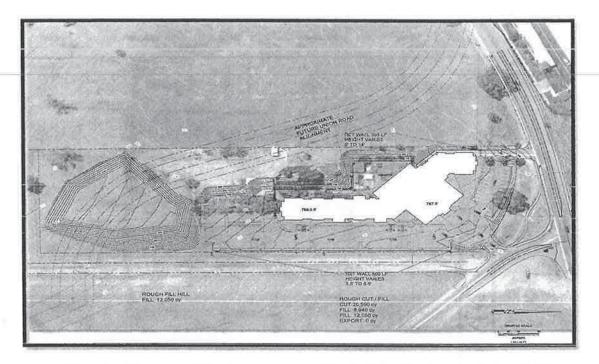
Site plan and development proposal for the Union Road project in Paso Robles.
